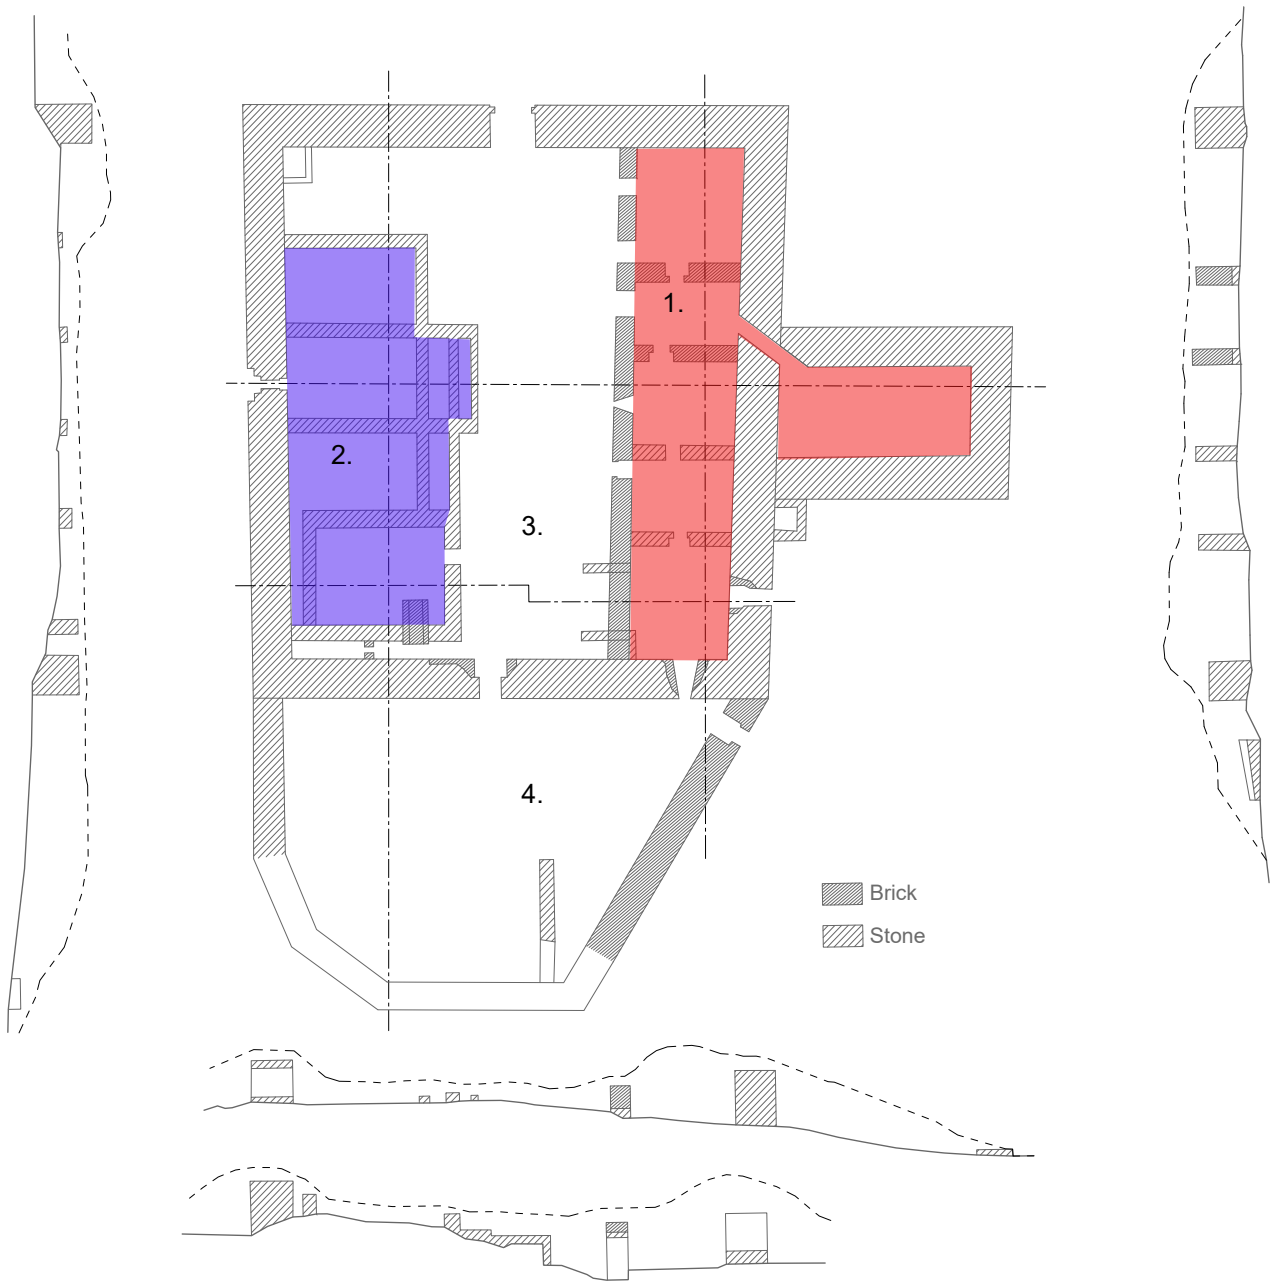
Annotated excavation plan and elevation based on Wilhelm Berg drawing from 1883. 1:500 (A4)
